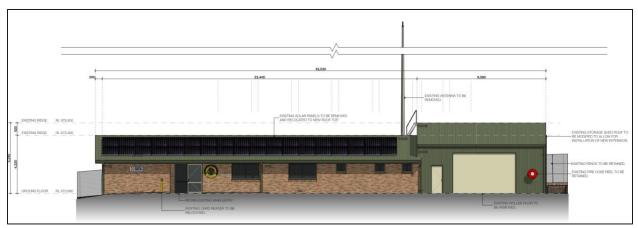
Existing East Elevation (Source: Lead Architects, 2024)
